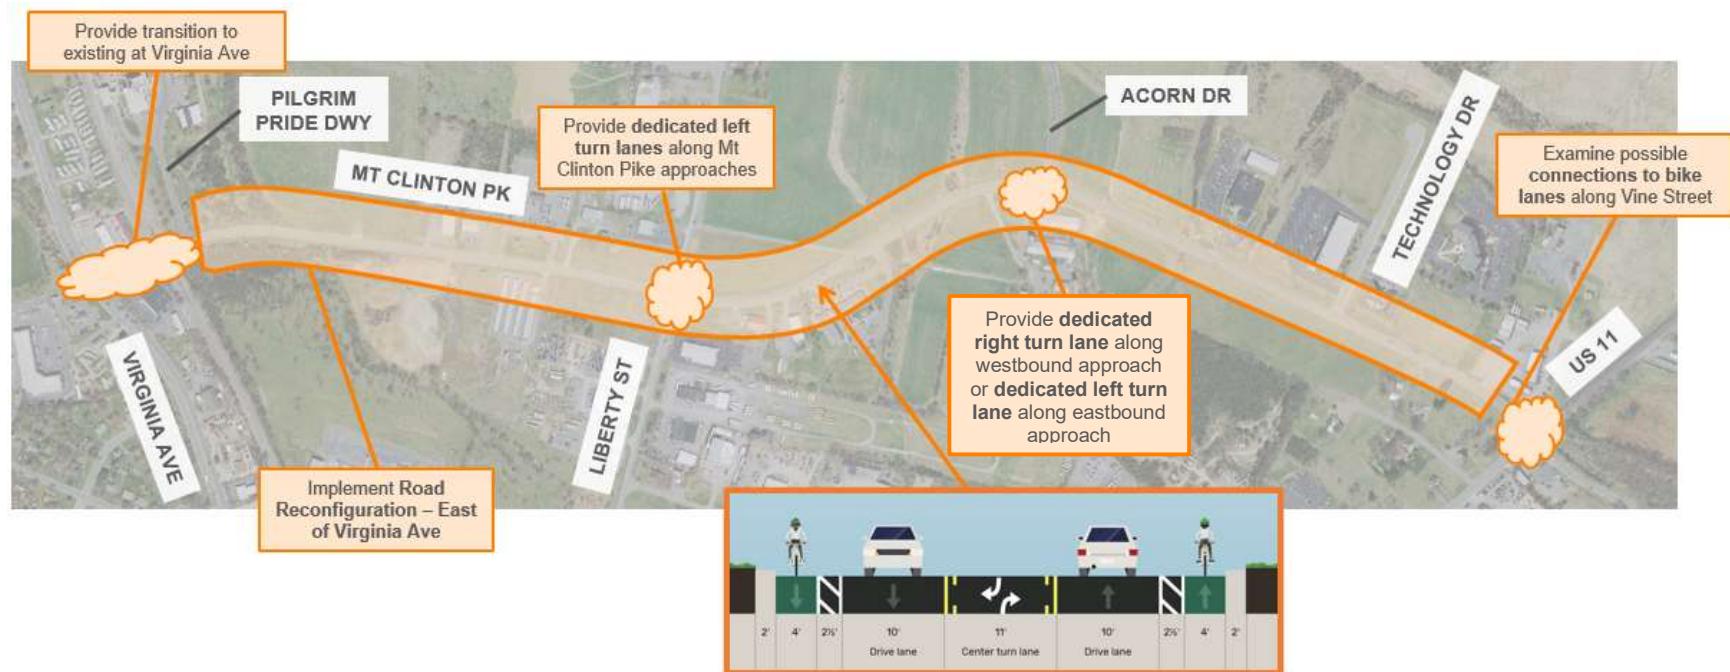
Mt. Clinton Pike - Recommended Improvements Layout
